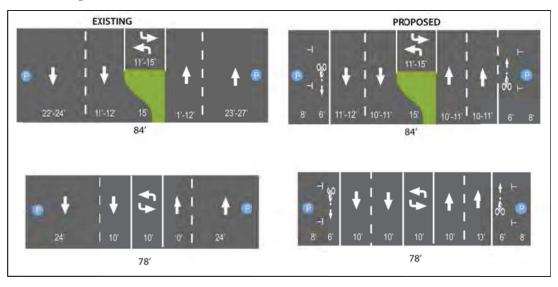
Second Avenue North of Puente Street Proposed Bike Lane Treatment
